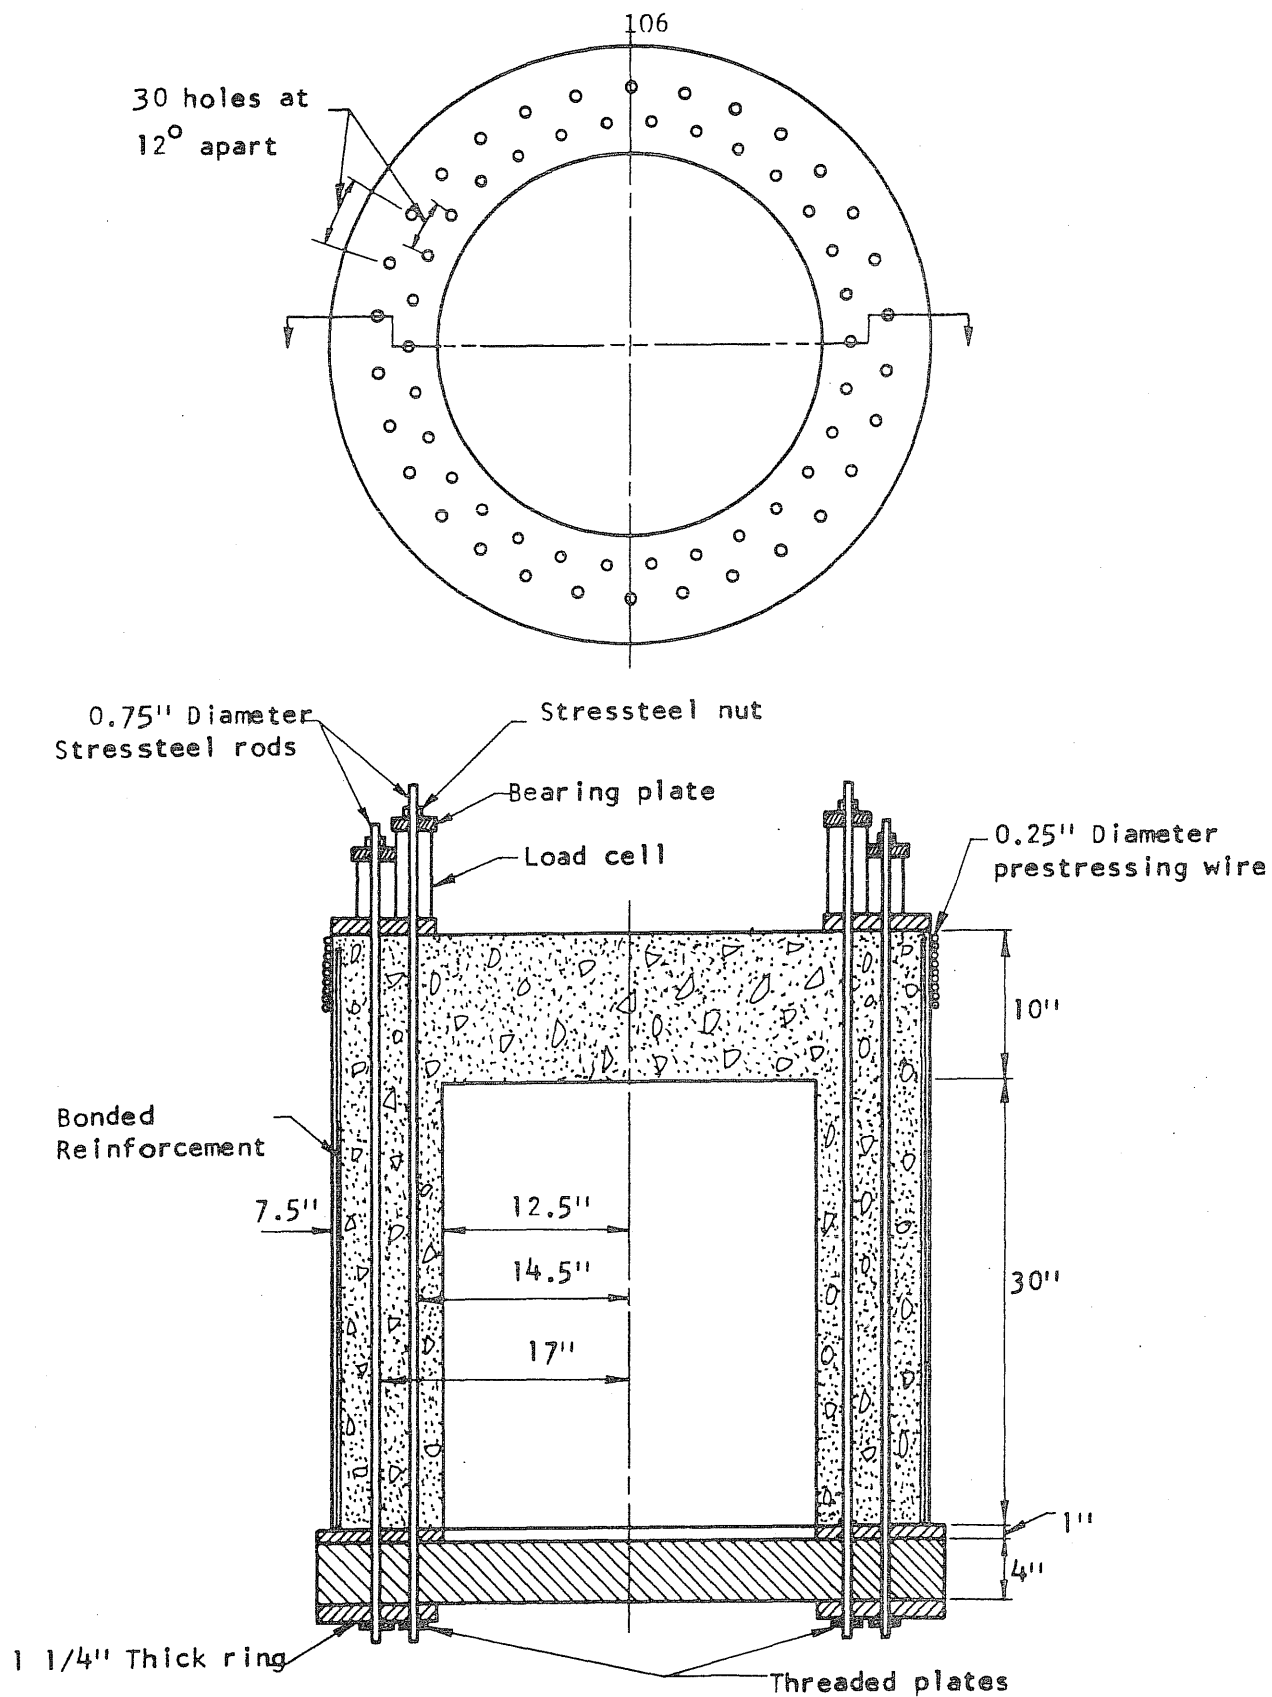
DIMENSIONS OF TEST VESSELS
